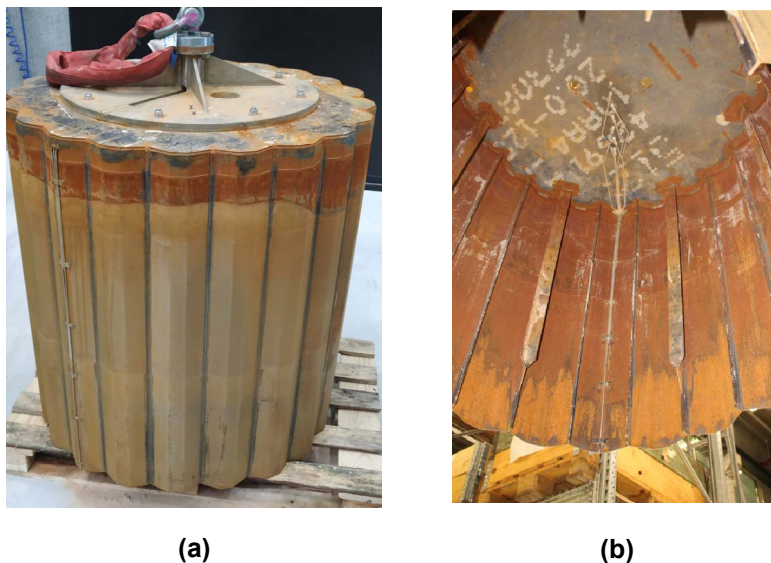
Modular model of bucket foundation: (a) outside and (b) inside with stiffeners
